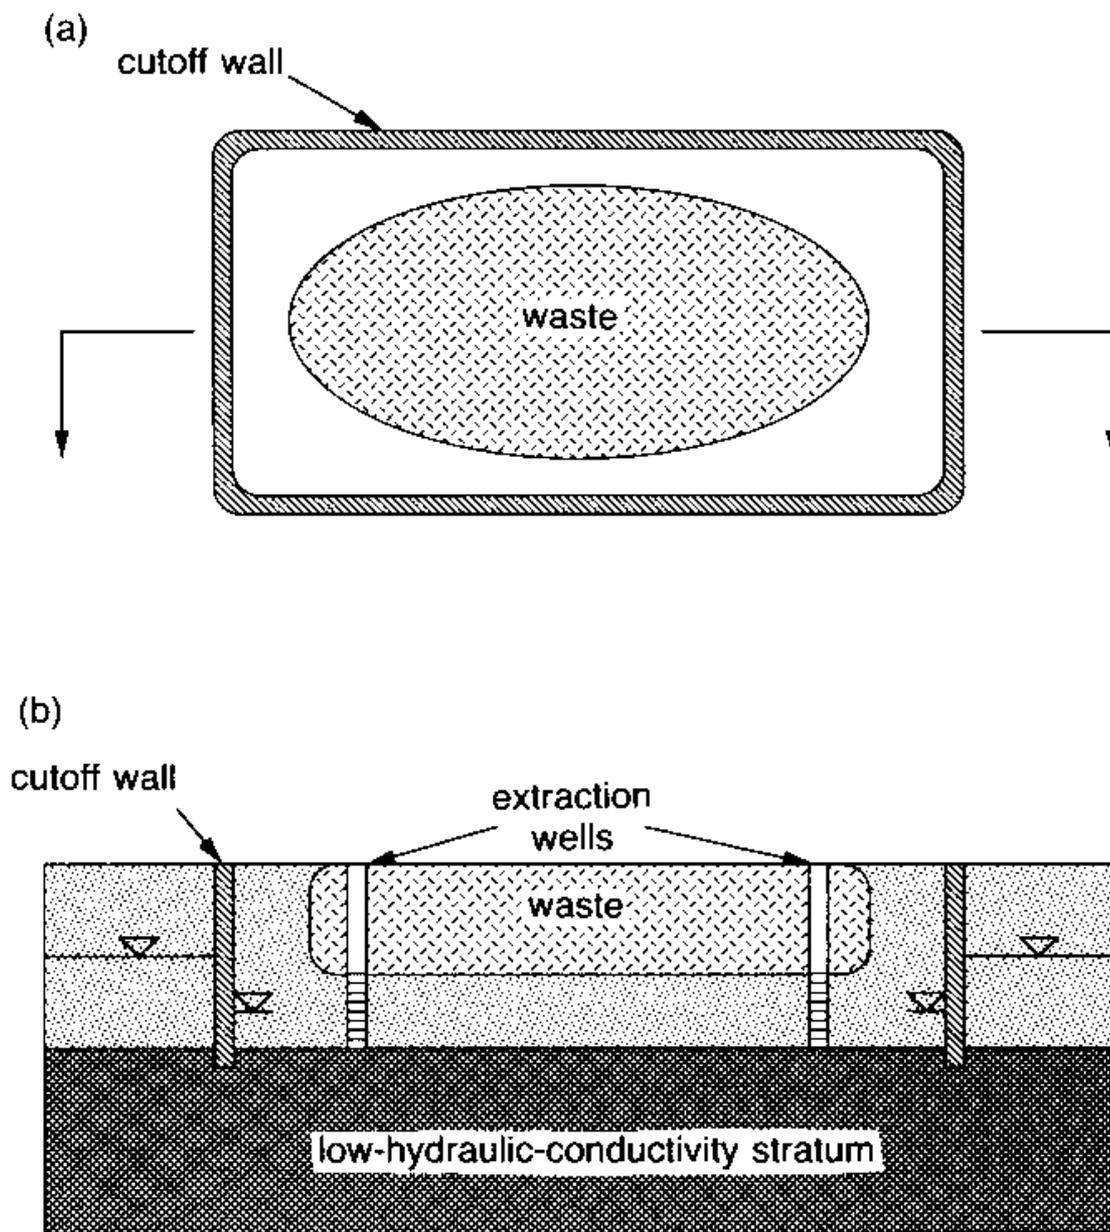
Schematic diagram of vertical cutoff wall configuration for typical site remediation project: (a) plan view and (b) cross-section.
